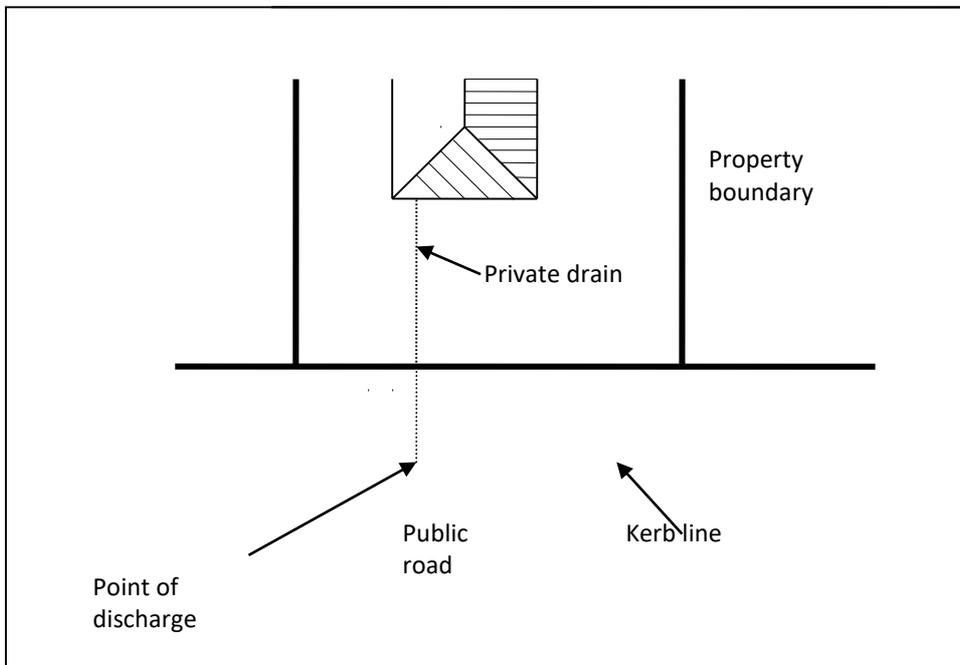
Point of Discharge Location - With Street Frontage To Kerb
